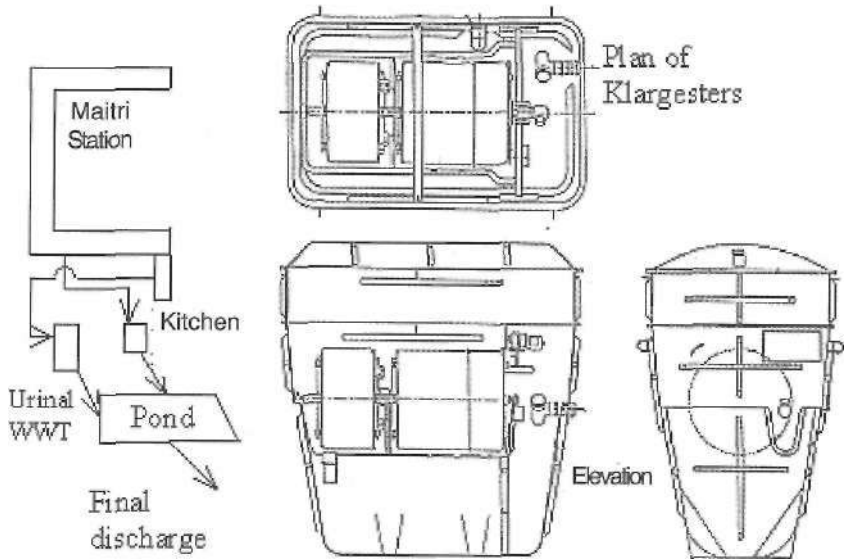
Schematic diagram of wastewater treatment and plan & cross section of Klargester's WWT unit at Maitri station.
